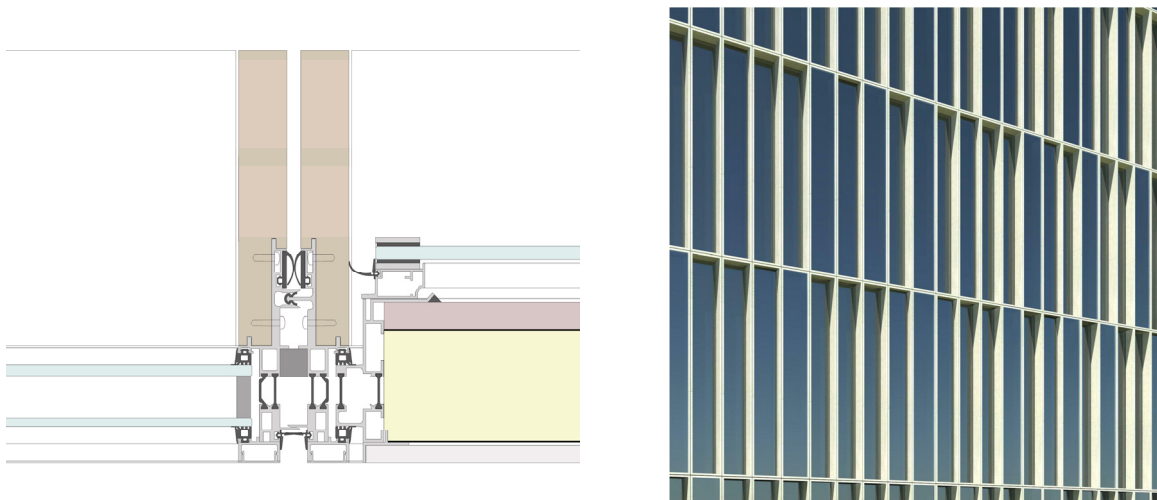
Detailed view of a horizontal cross-section and view in perspective of a possible architectural configuration of the entire FB720 façade system
